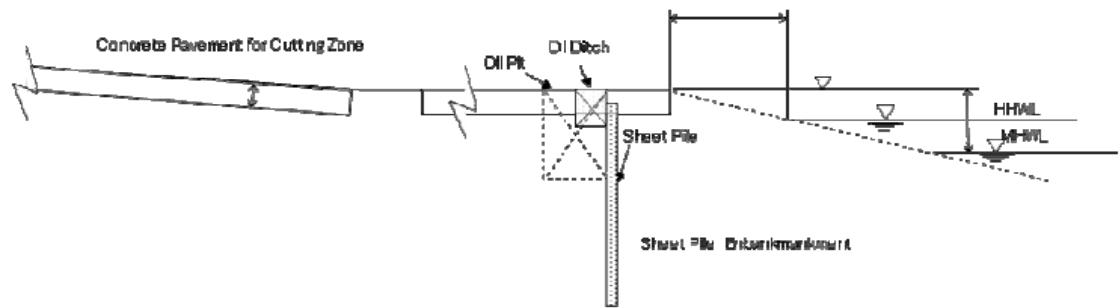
Elevation of Improvement of Existing Ship Recycling Yard
